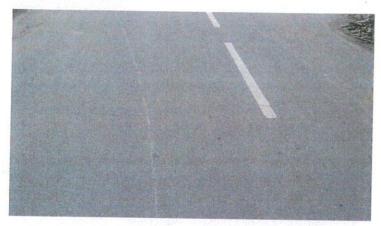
Depth of Crack propagation on Stabilized Pavement
